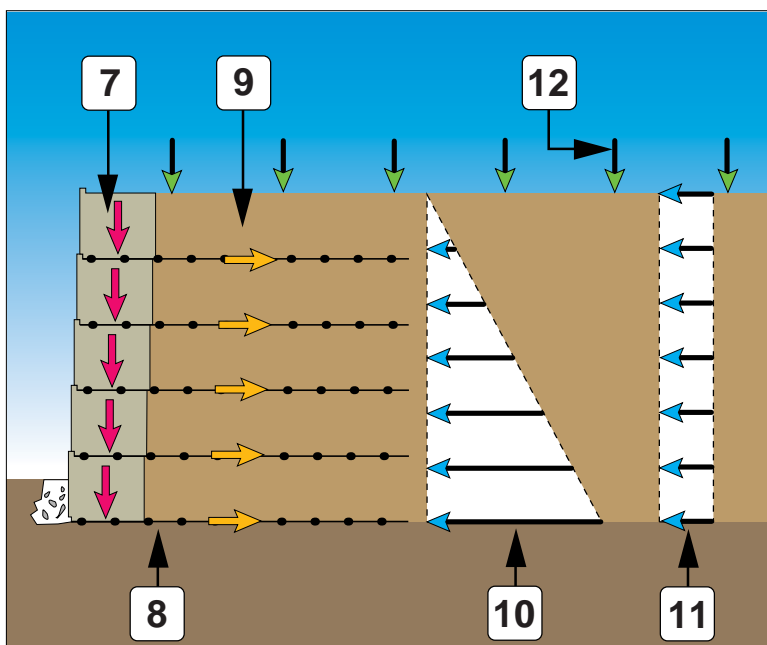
Statics of TENAX NURAGHE retaining wall System.
